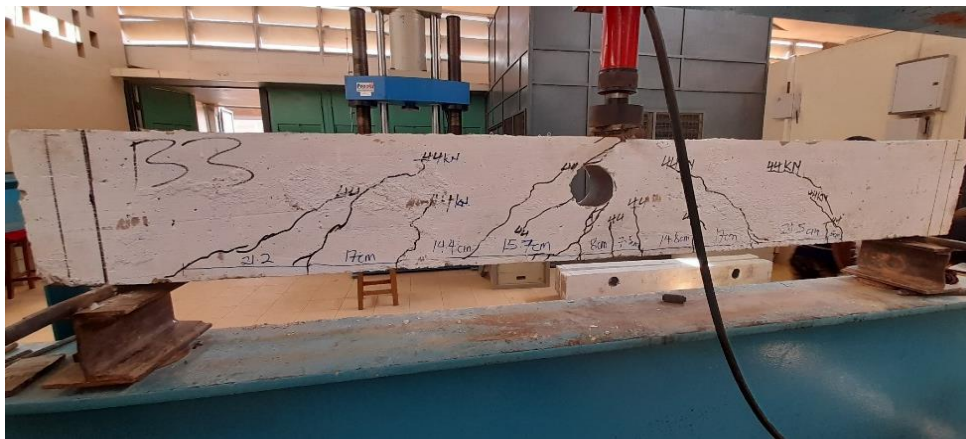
3-point loading test of RC beams with openings embedded with PVC pipes
